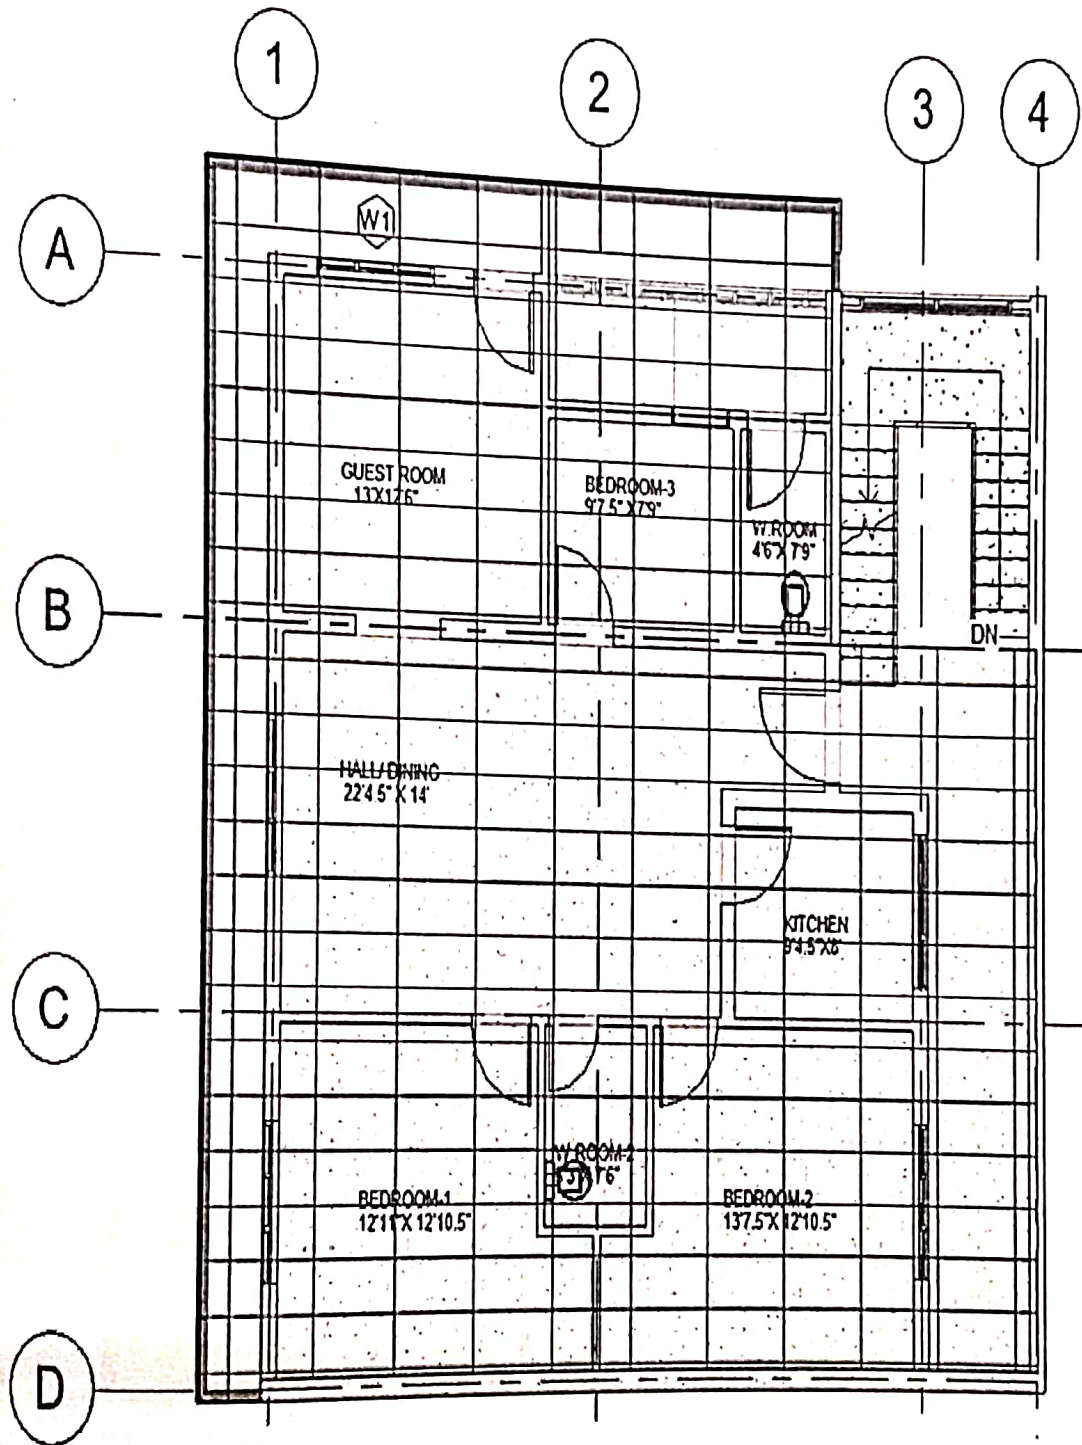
2<sup>nd</sup> LEVEL PLAN
